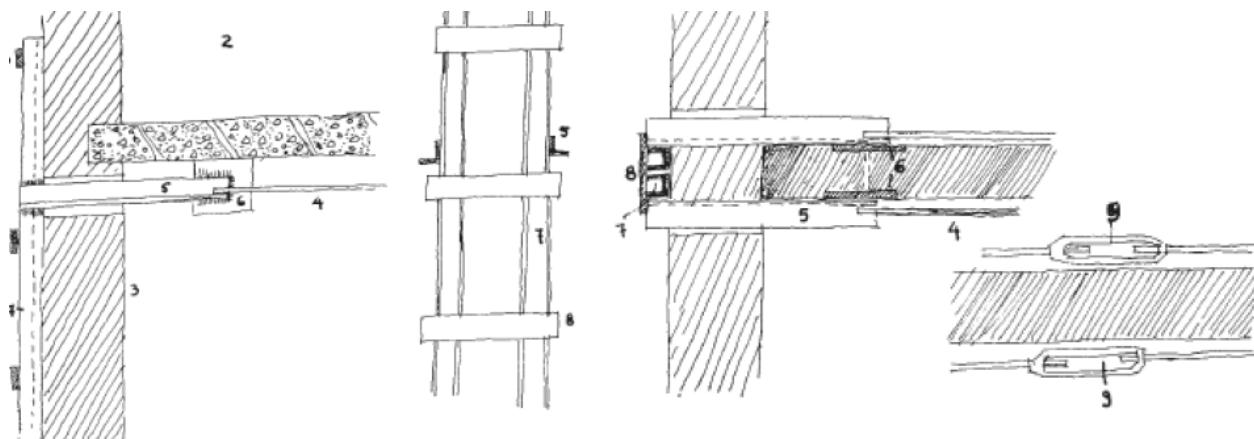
Shoring with internal anchorage (EPPO, 2000)
